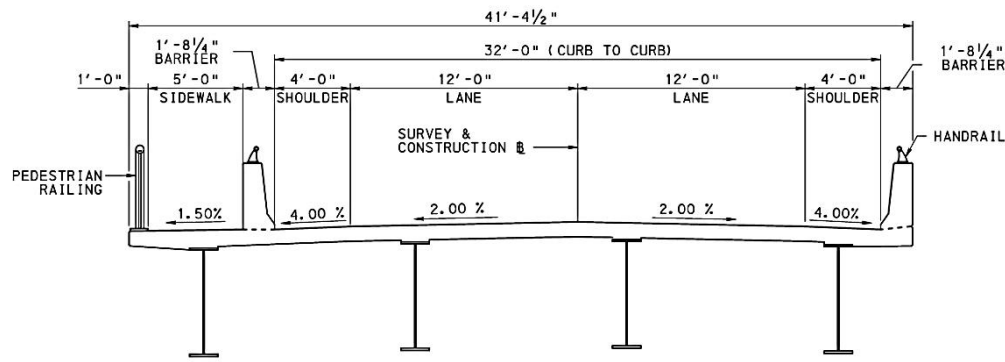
2nd Avenue to Hospital Drive Connector Roadway Typical Section
